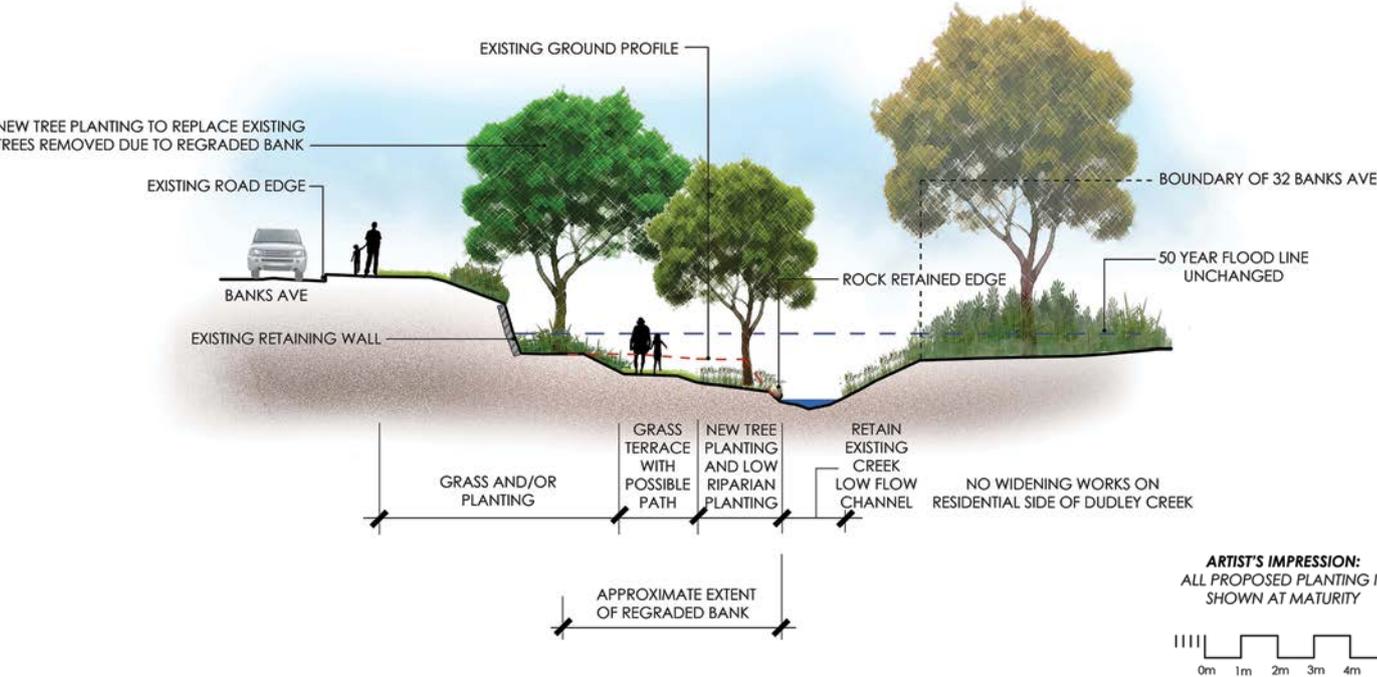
Downstream Option A – Cross Section D (looking downstream from 36A Banks Avenue)
